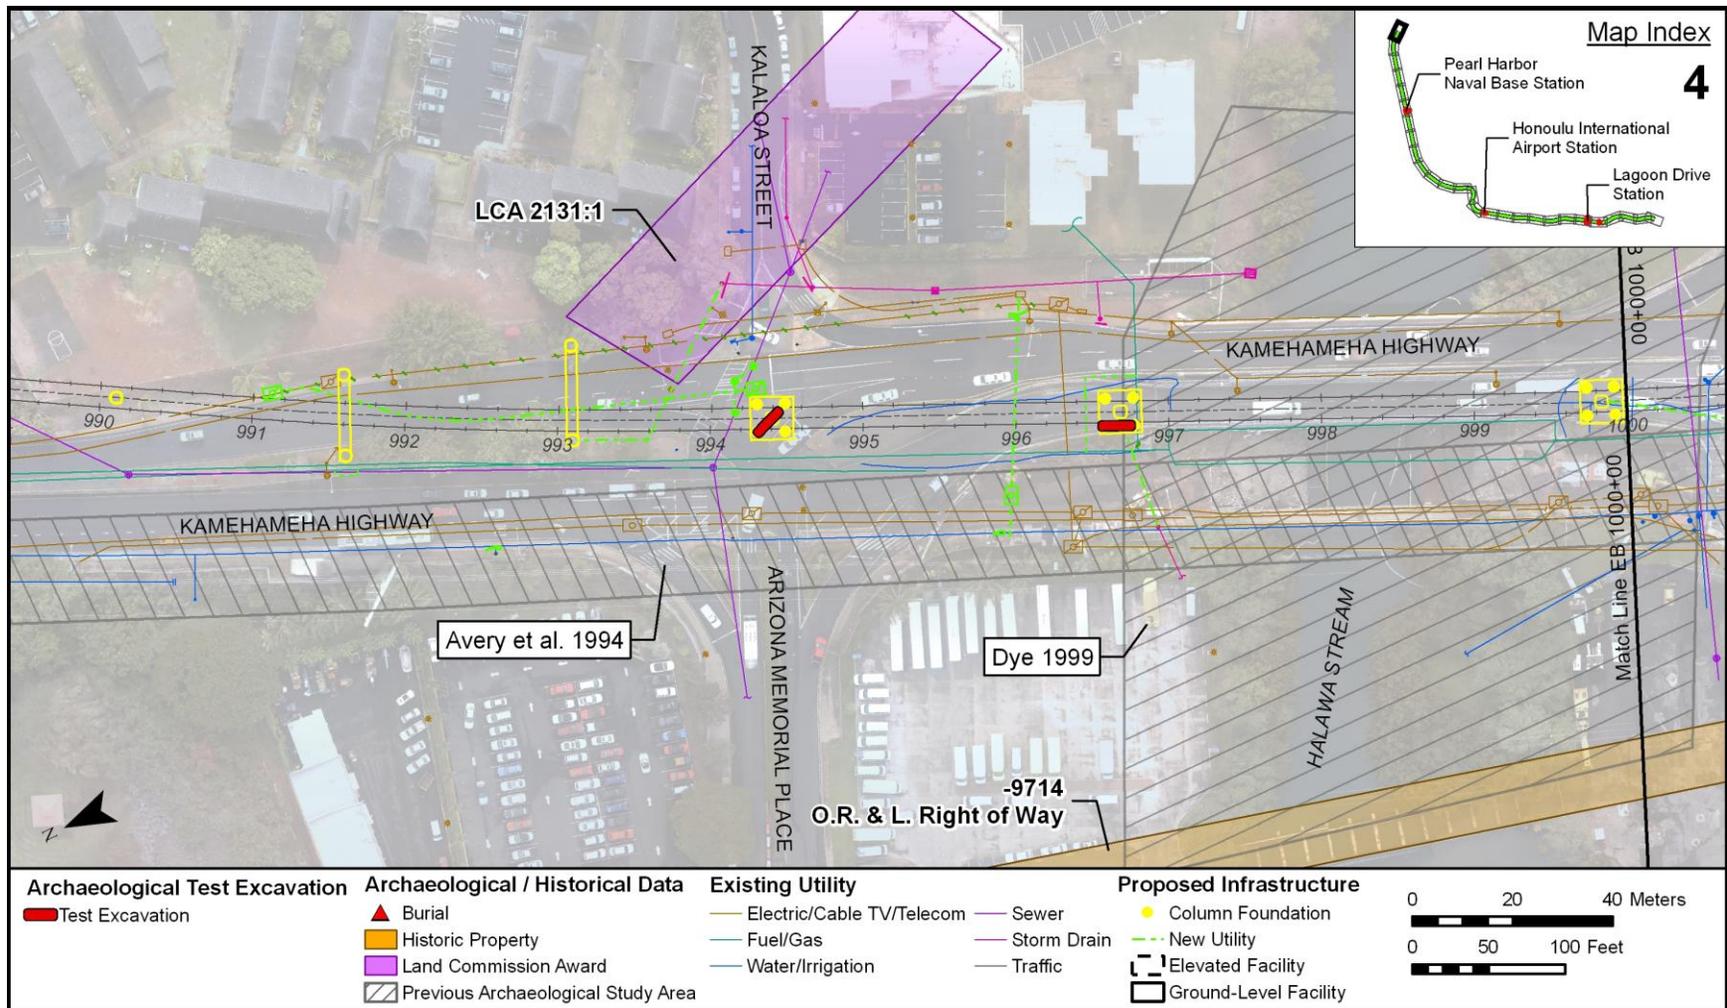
Map Sheet J 4 (near Kalaoa Street), two 20x2 excavations at column foundations @ 994+40 & 996+70
